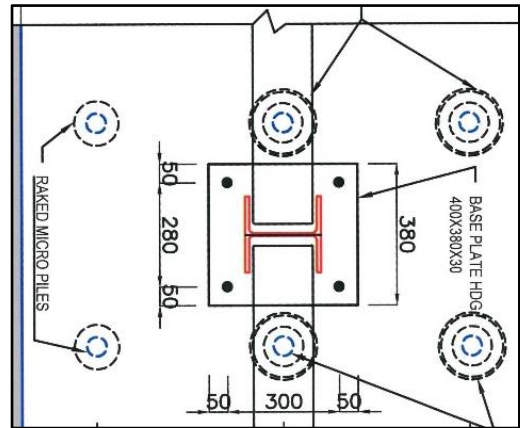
Titan 52/26 A Frame Micropiles for Retaining Wall Footing
